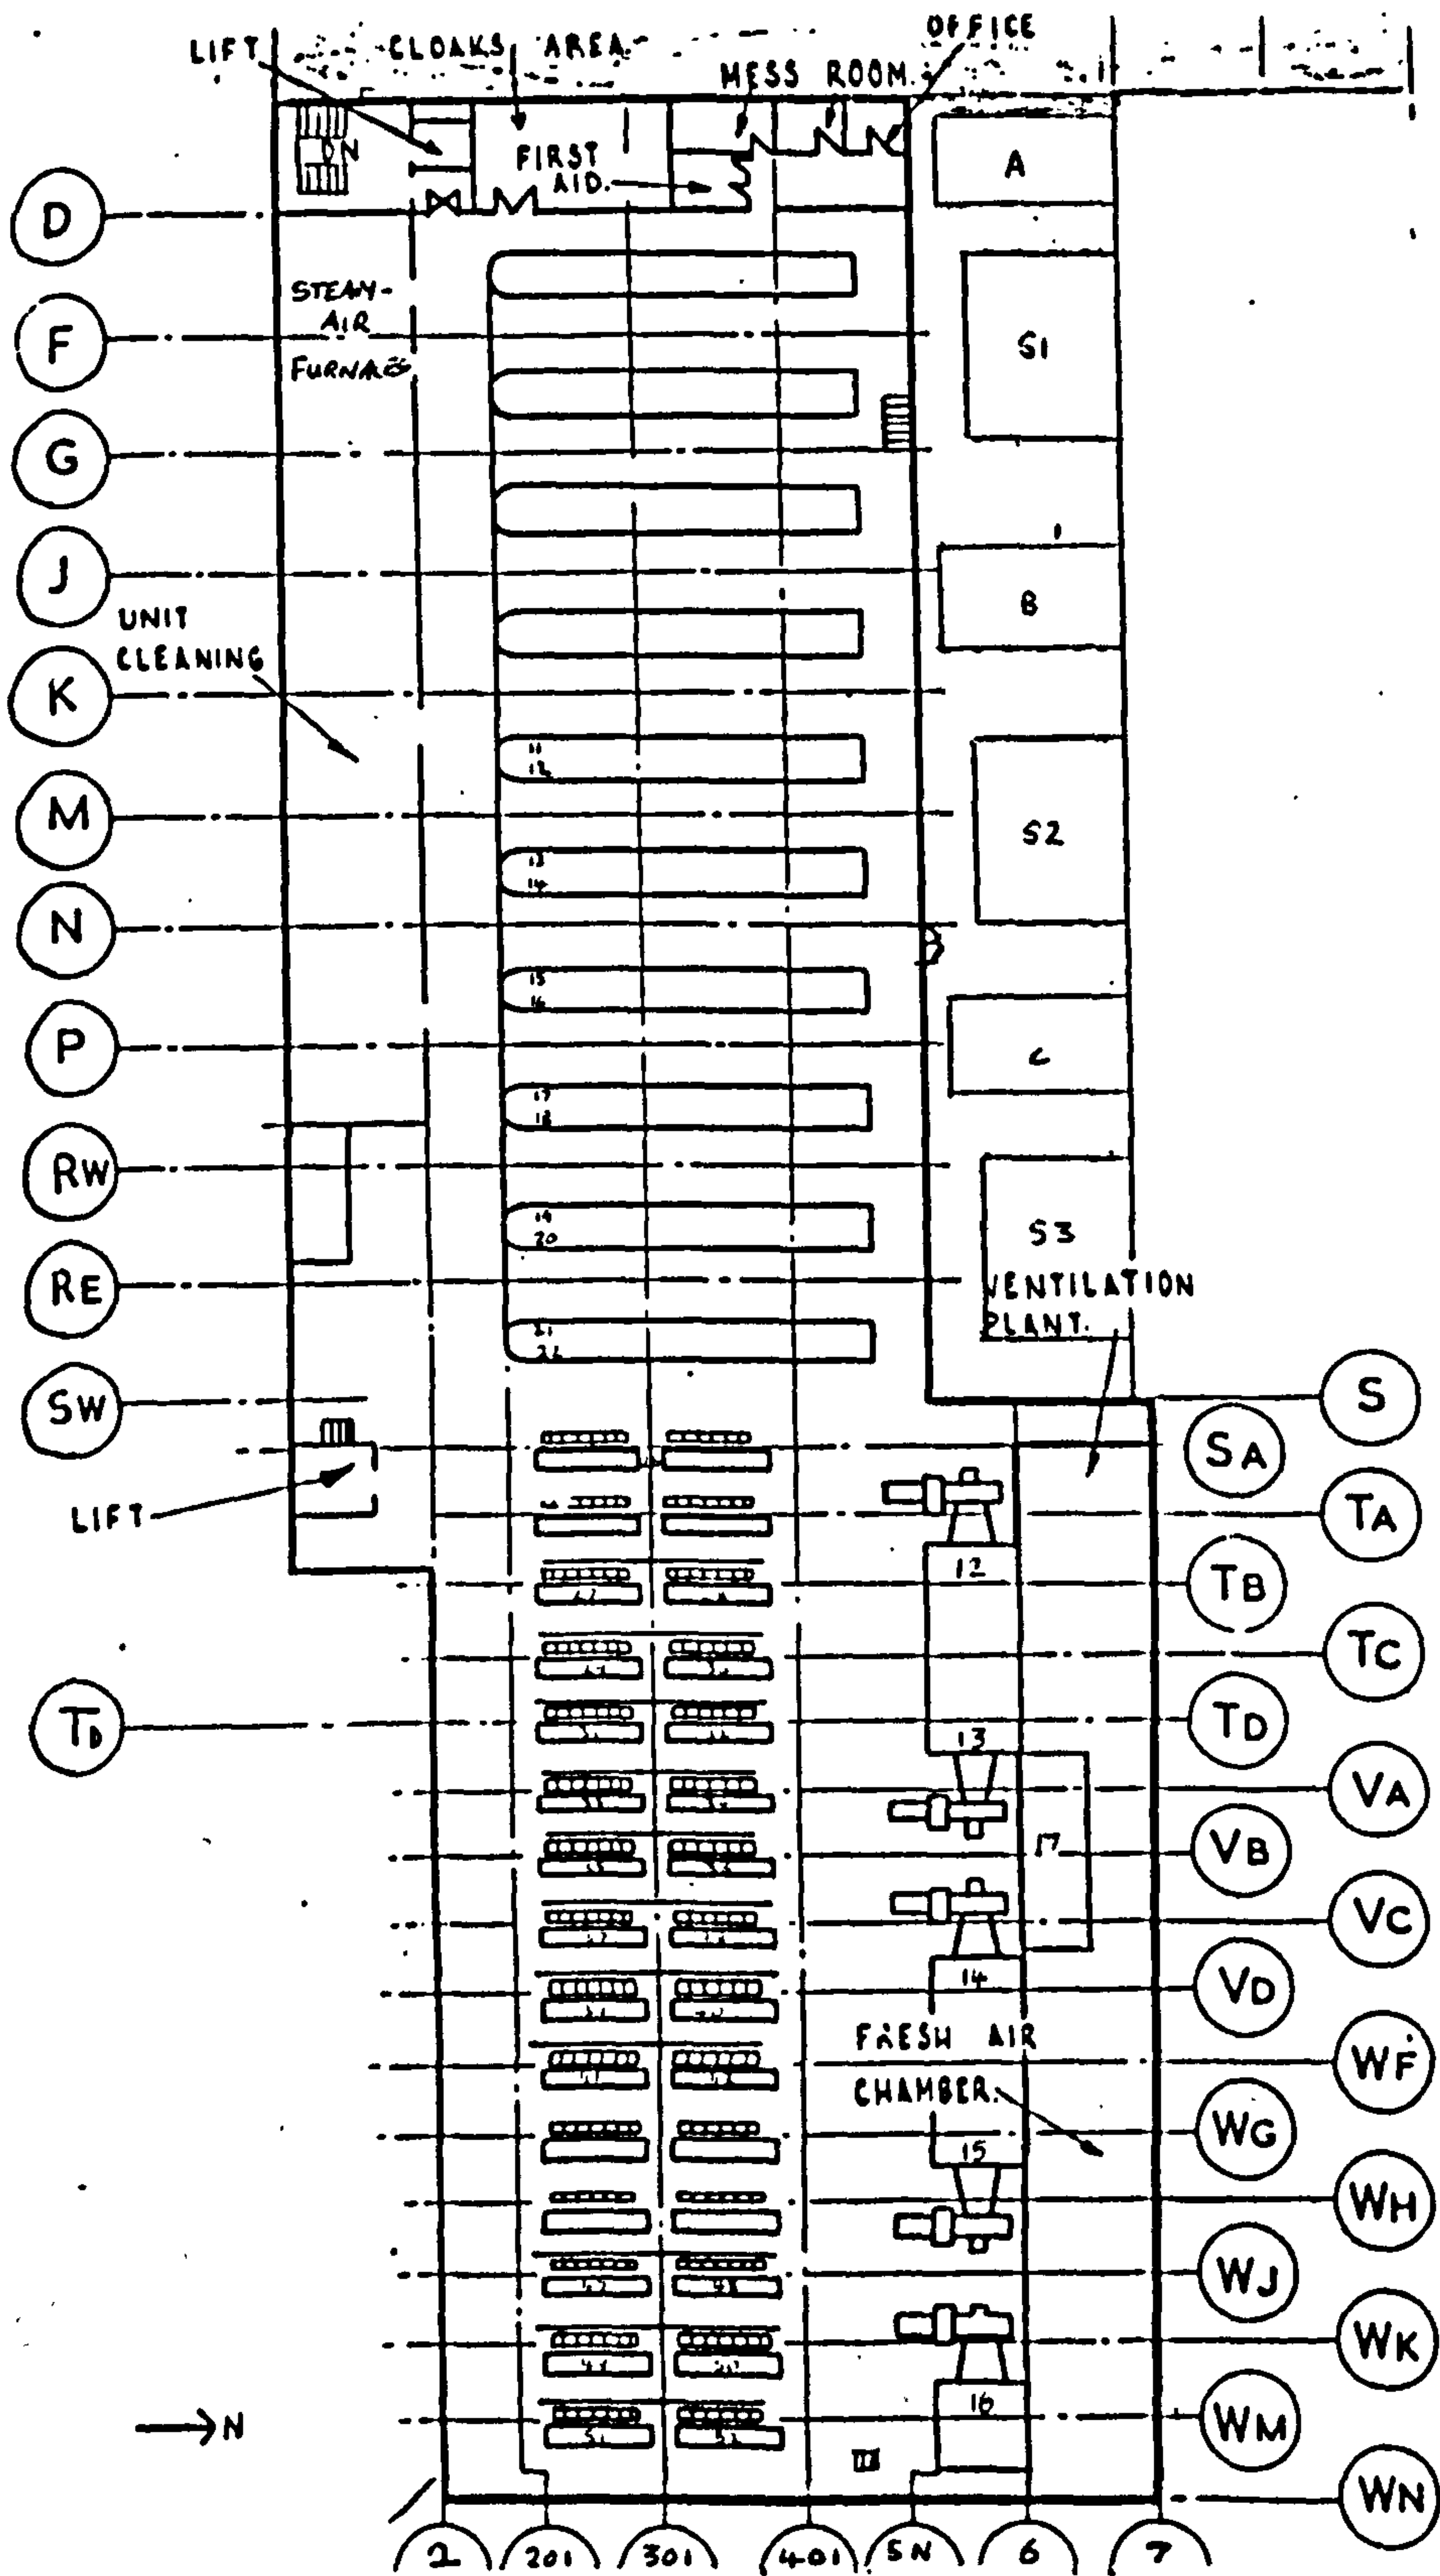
SECOND FLOOR PLAN (HOPPER FLOOR)
